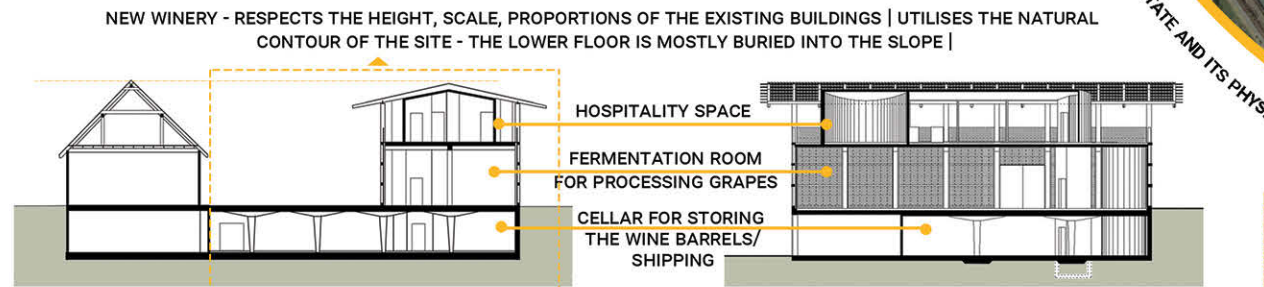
, 6. WINERY'S TRANSVERSAL AND LONGITUDINAL SECTIONS, REFLECTING THE CONNECTION WITH THE TERRAIN AND HOST BUILDINGS
